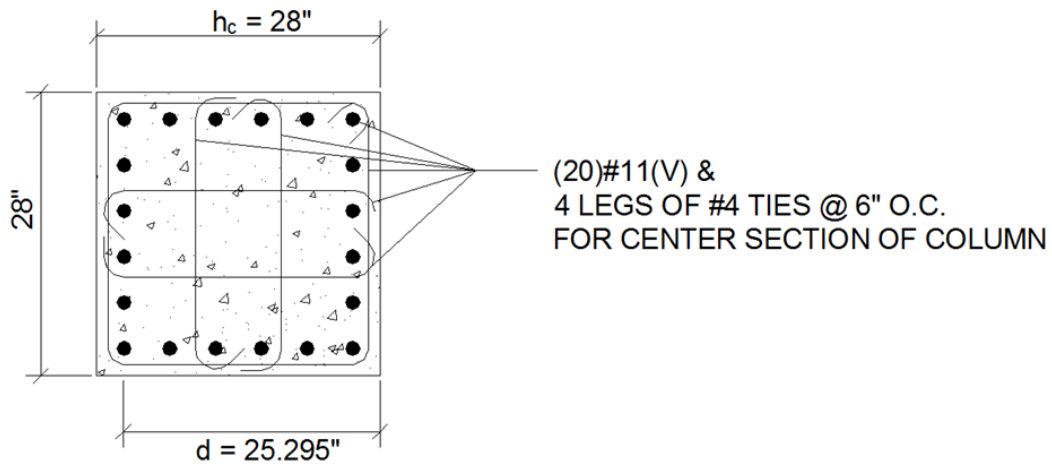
Exterior column, cross-section at center section of column at ground floor level based on tsunami design requirements.
